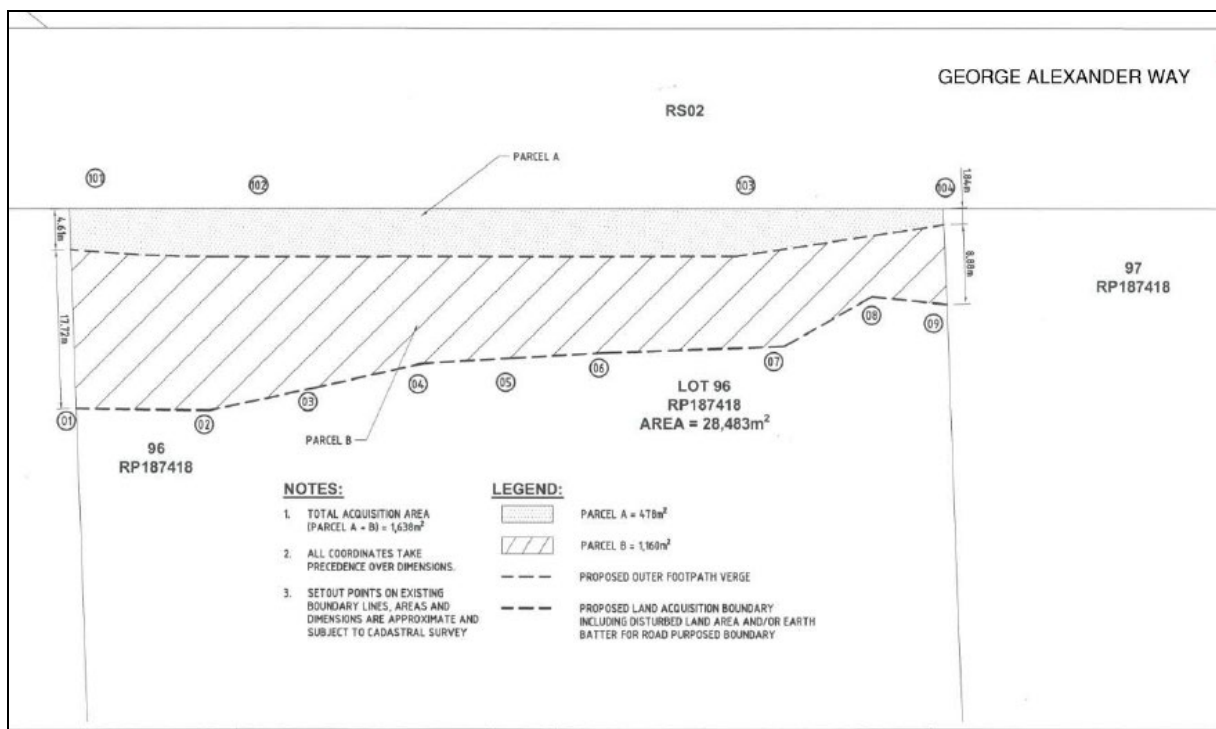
Roadworks extent plan (Source: Burchills Engineering Solutions)
